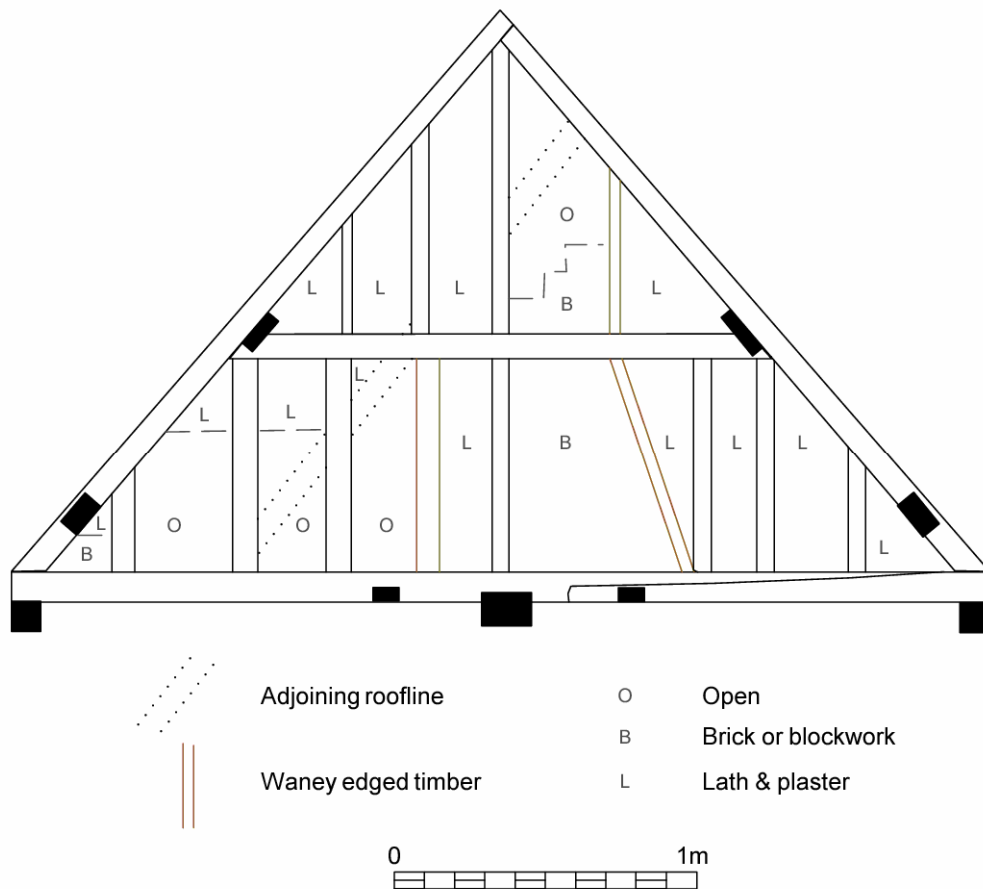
Schematic drawing of the north gable end of F7 roof (*scale 1:25*)
